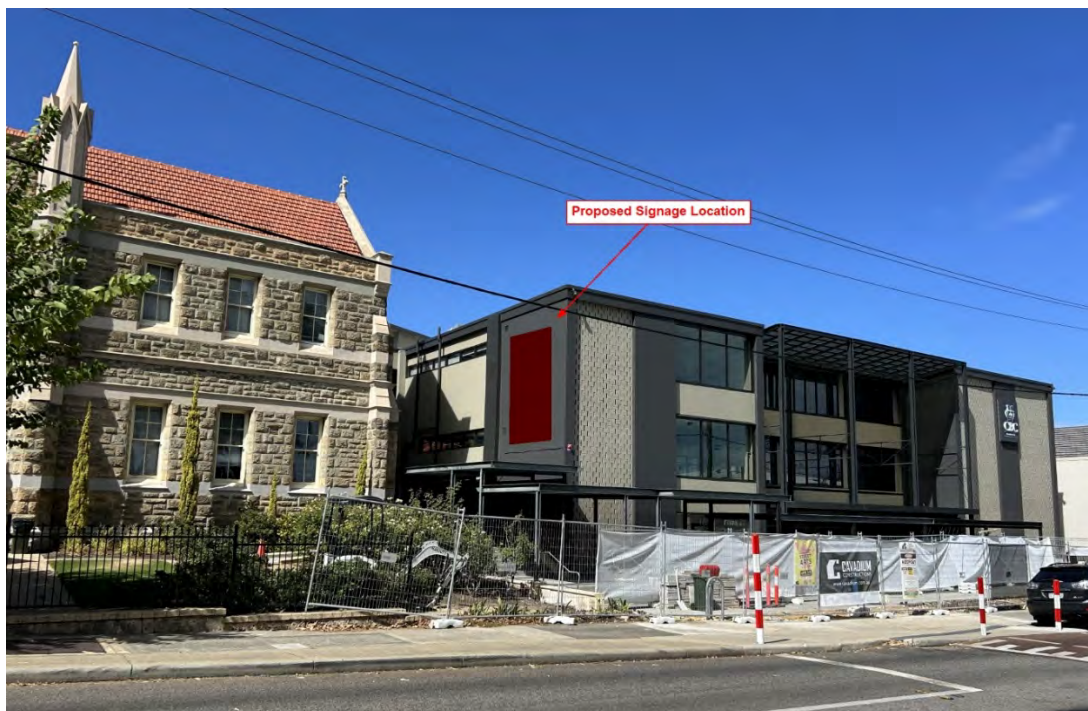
Subject site when viewed from Ellen Street with proposed location of signage (view southwest)
